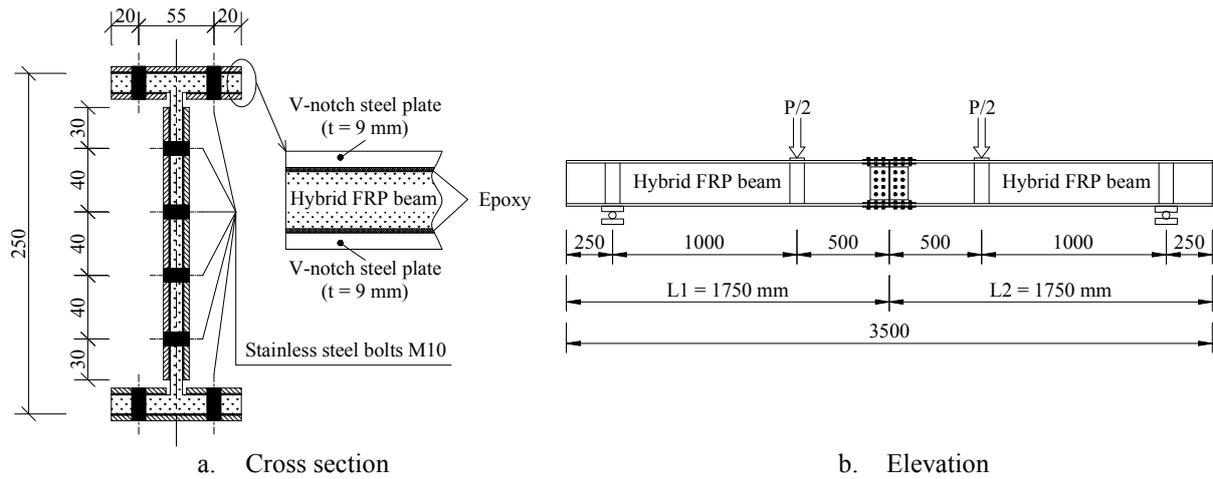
Details of specimen for full-scale test of bonded-and-bolted joints
